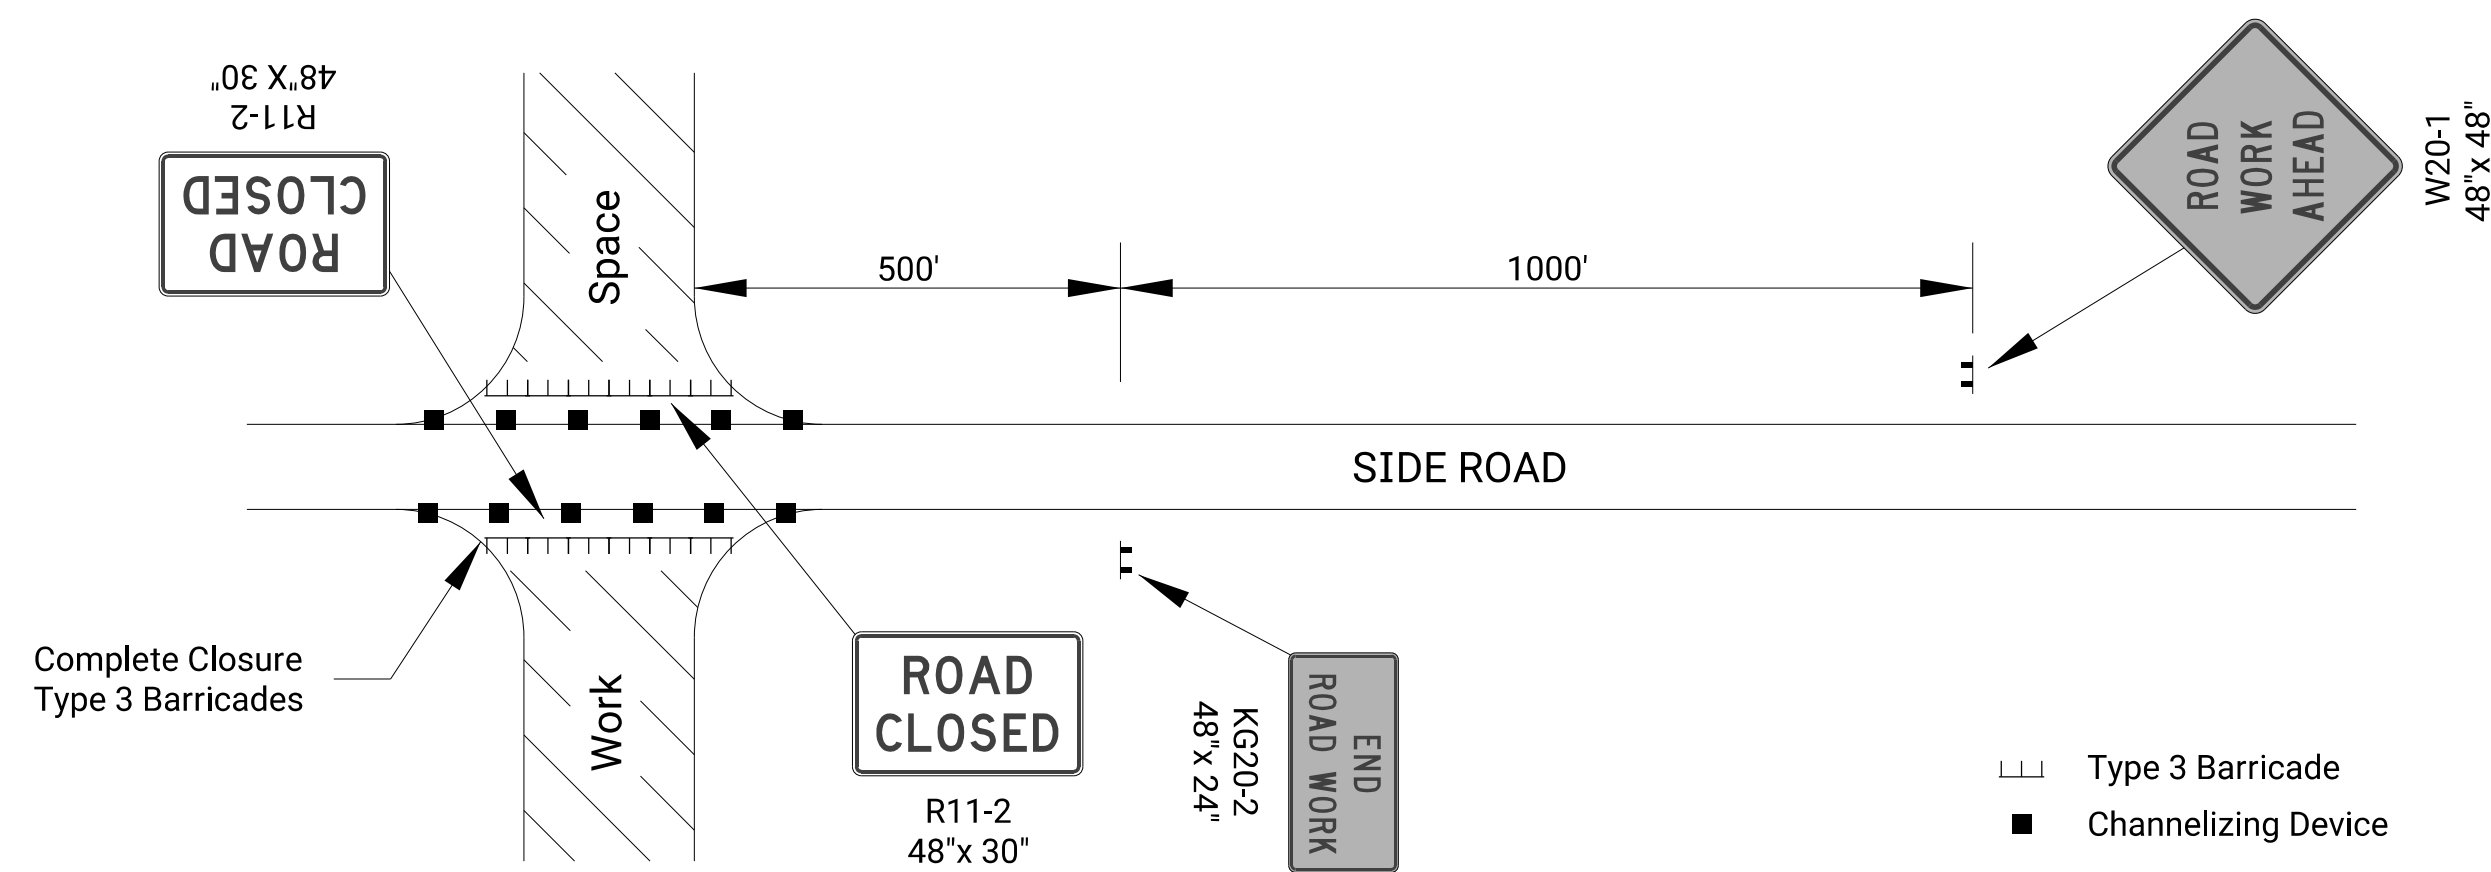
TYPICAL SIGNING FOR SIDE ROAD OPEN
